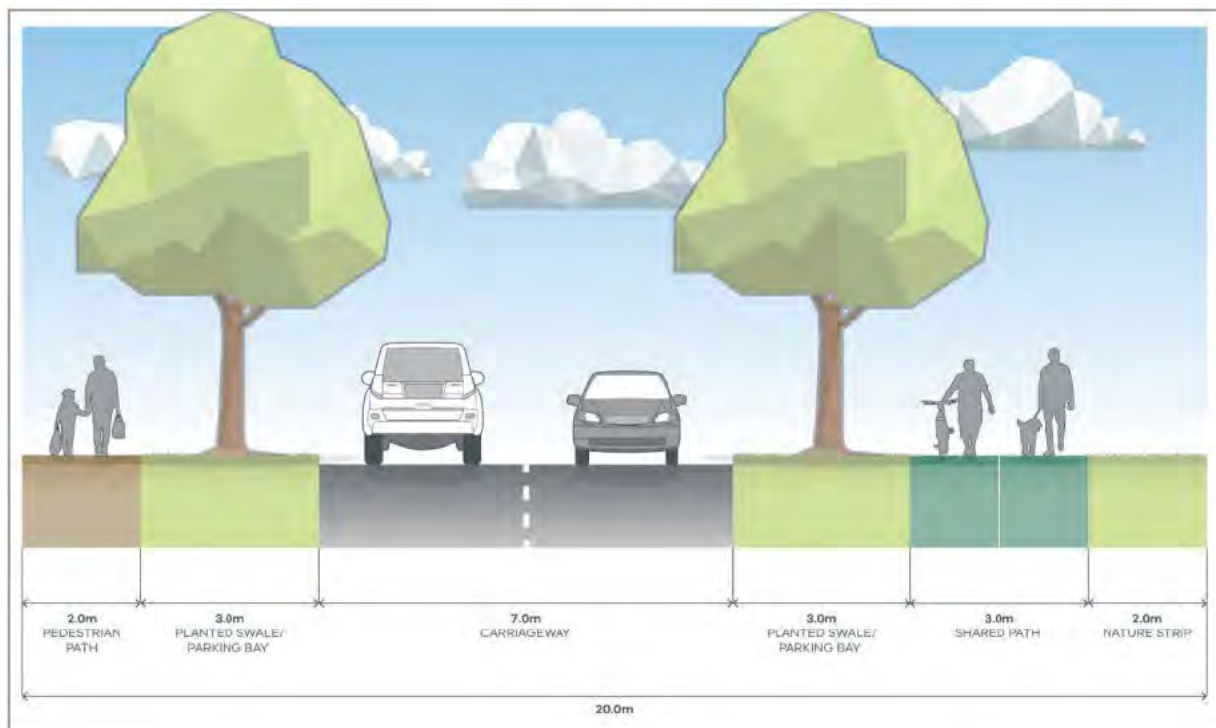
Casey Fields (Employment) PSP – Local Access Street – Employment Service Loop Cross-Section (20m)
